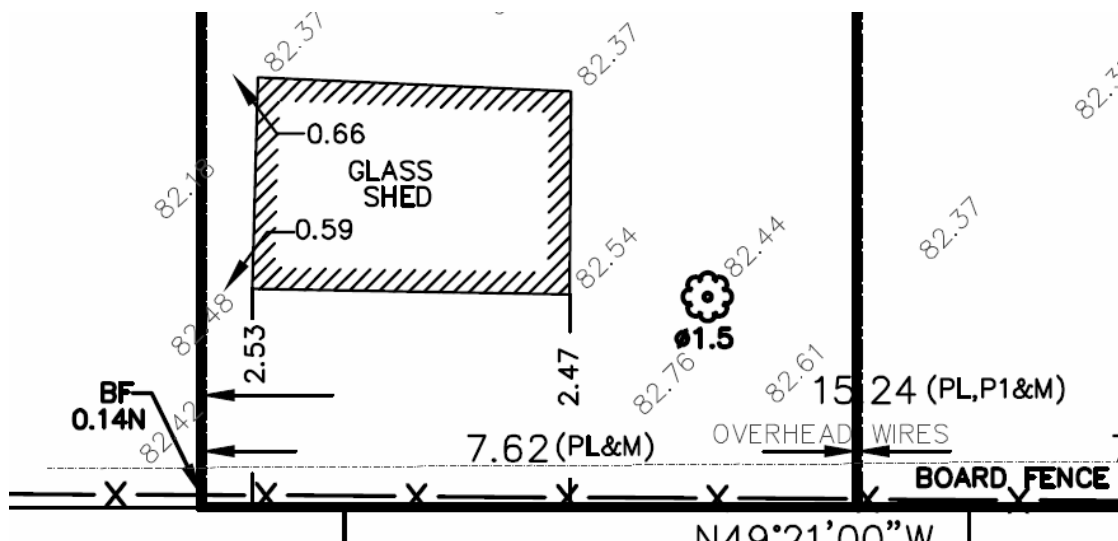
Site plan showing rear greenhouse, 2019. *(Image from owner.)
